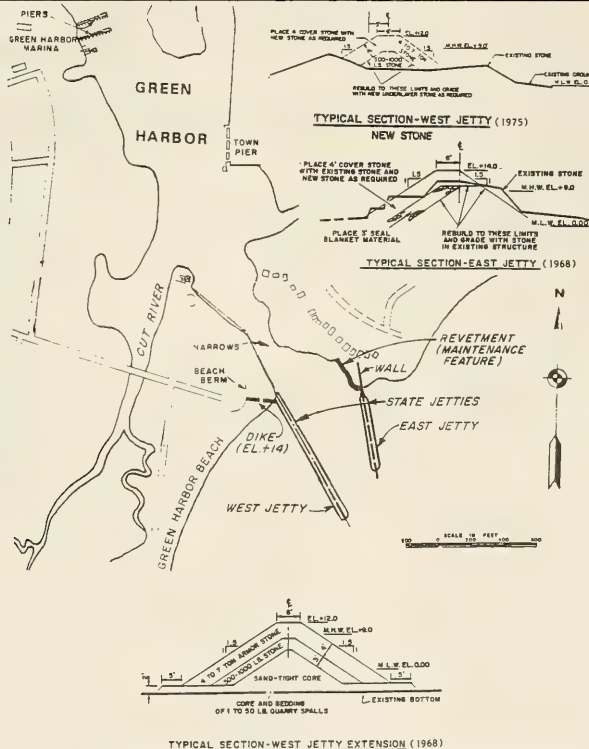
Plan view and cross sections of jetties at Green Harbor, Mass.
